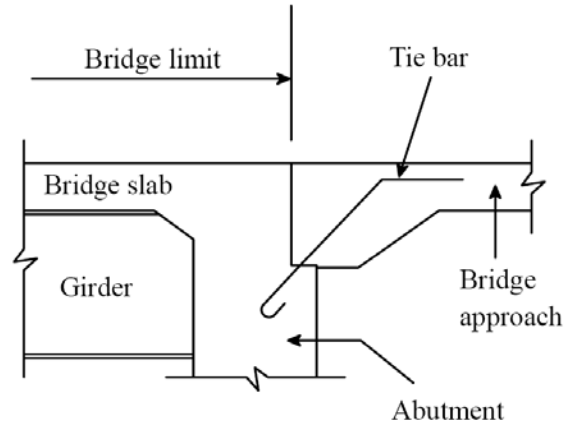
Bridge Approach Connected to Abutment (Ohio DOT, 2003)
